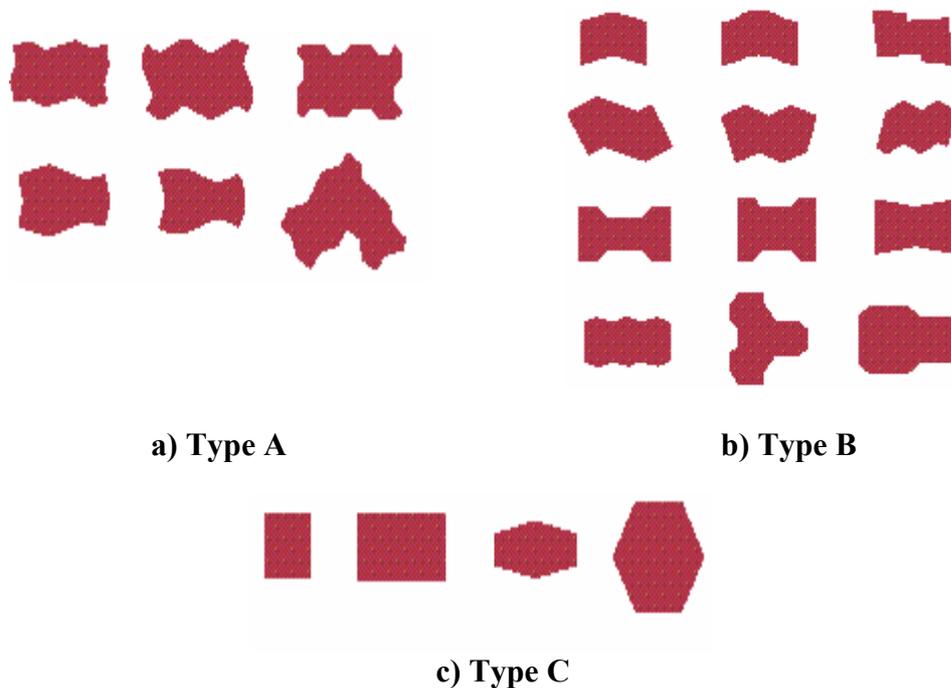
Typical Shapes of Paving Blocks [Concrete Masonry Association of Australia 1997b].
